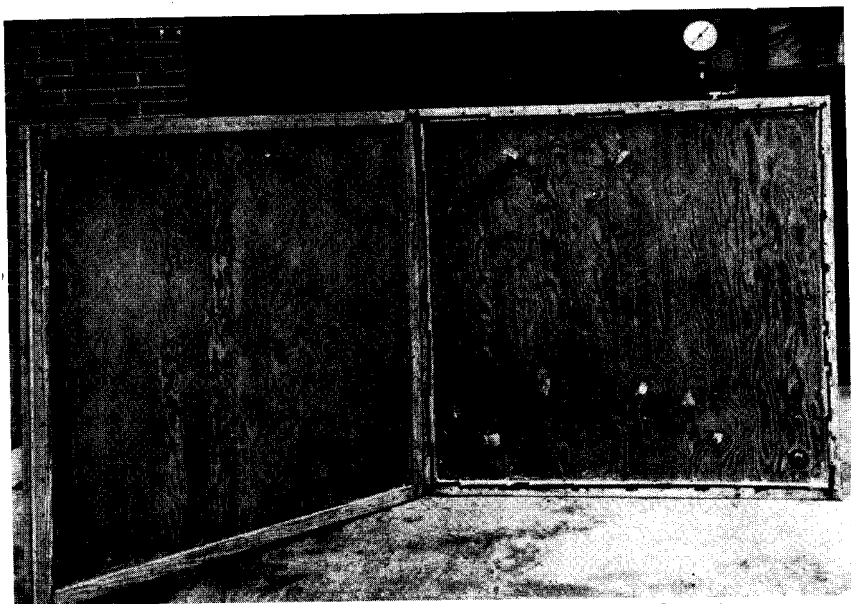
Plywood panels mounted on frames, before bolting together for water pressure.
